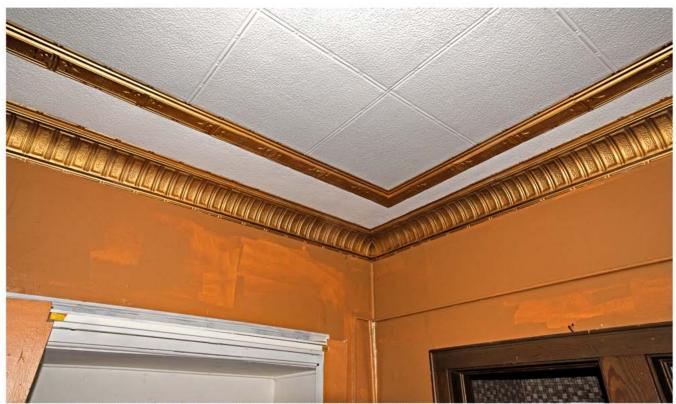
Interior view southeast showing crown molding on south eastern section of north retail space.
